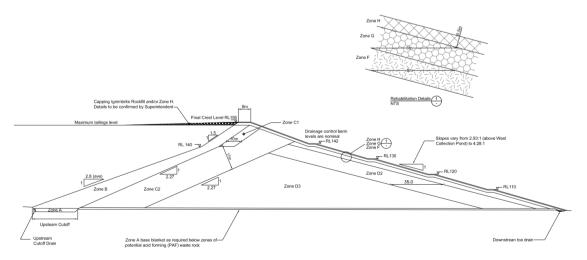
TYPICAL SECTION OF STORAGE 2 EMBANKMENT
